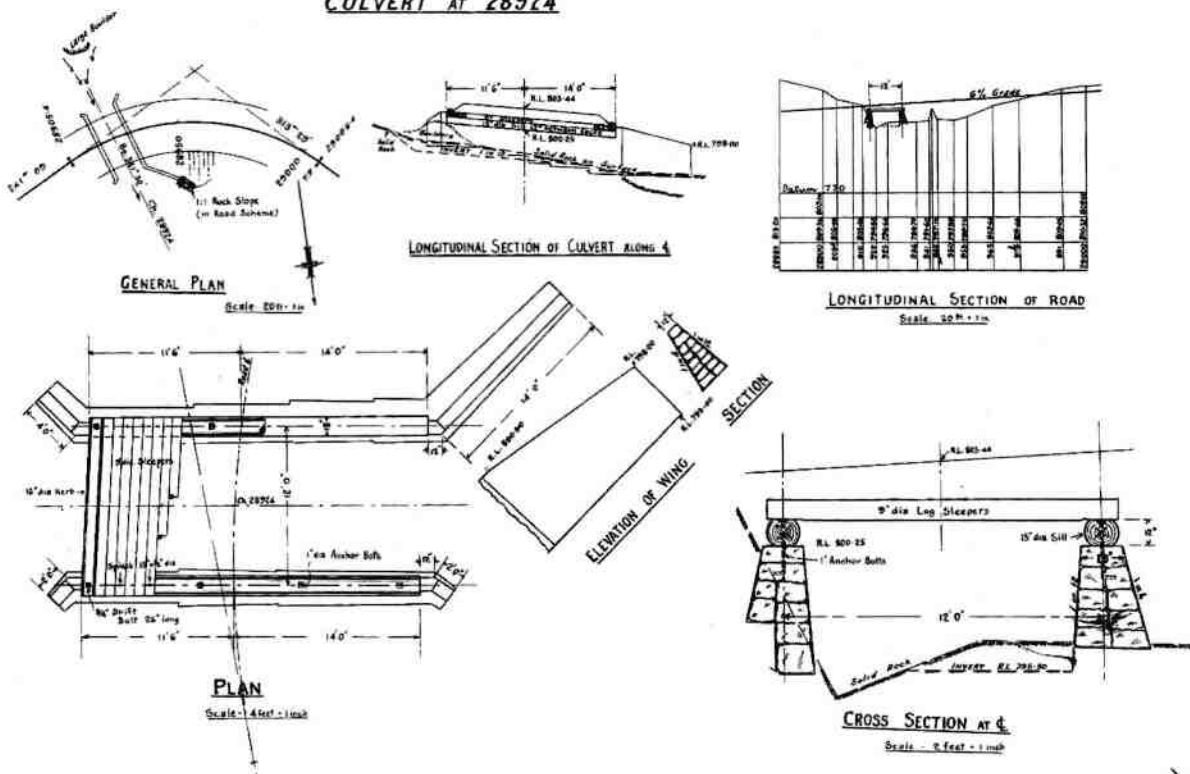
Original drawing no. 11482 of Culvert 163A at Noah's Ark Creek. The initial design was for a timber girder bridge (drawing no. 11283) but this was never built. Source: Qld State Archives
